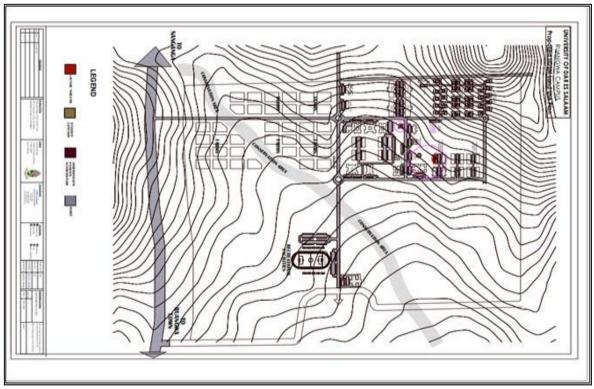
Site Layout at Likunja Centre. Source: BICO, Architectural Drawings
